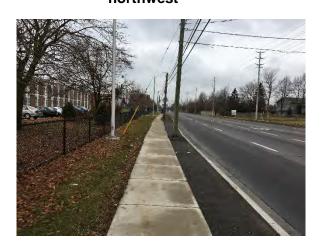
Bramalea Road Southeast of Clark Boulevard, facing southeast
